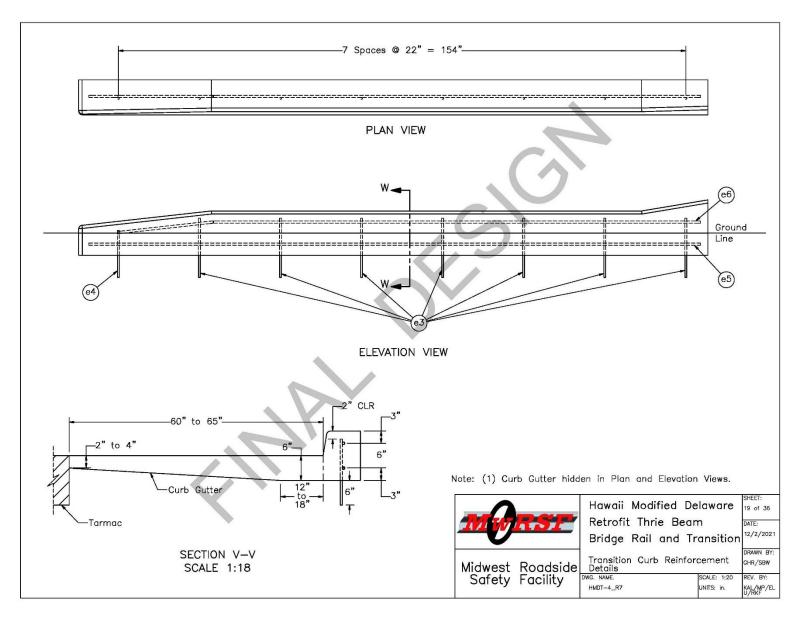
Transition Curb Reinforcement Details, Test No. HMDT-4
